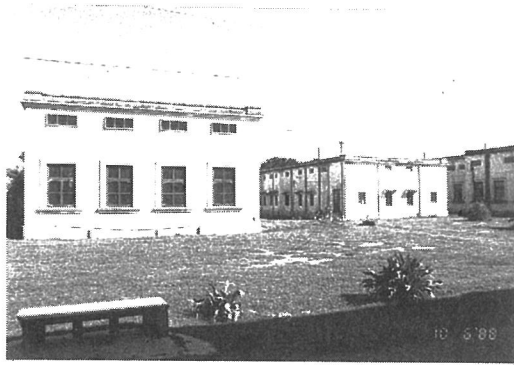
Undamaged buildings located close to the damaged Medical College Hospital, Darbhanga
